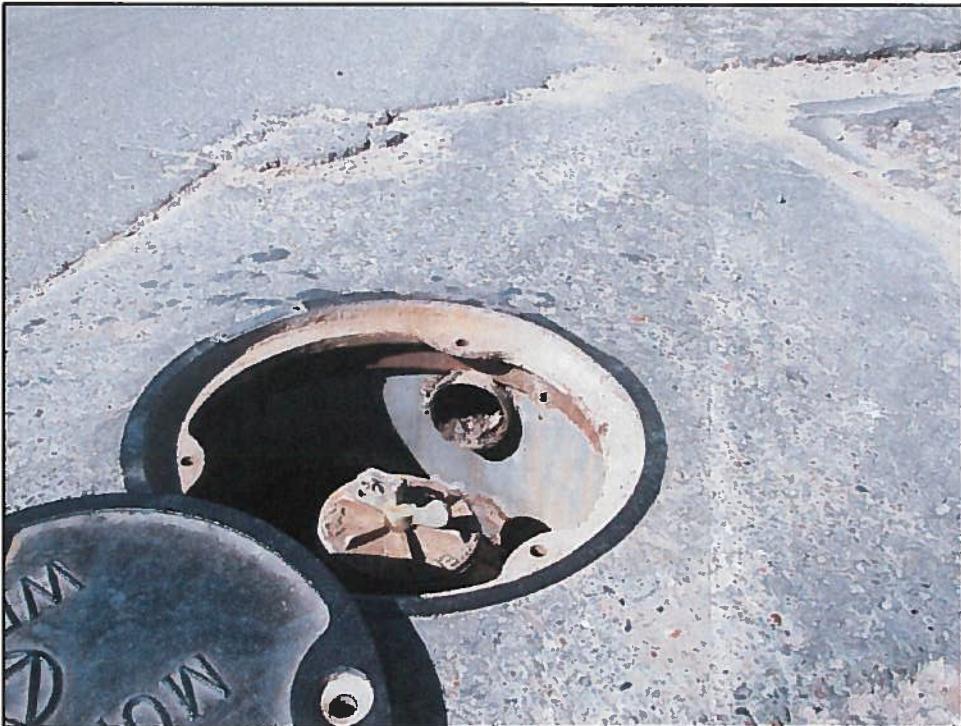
MONITOR WELL W-3 CONVEYANCE PIPING BETWEEN WELLS.
